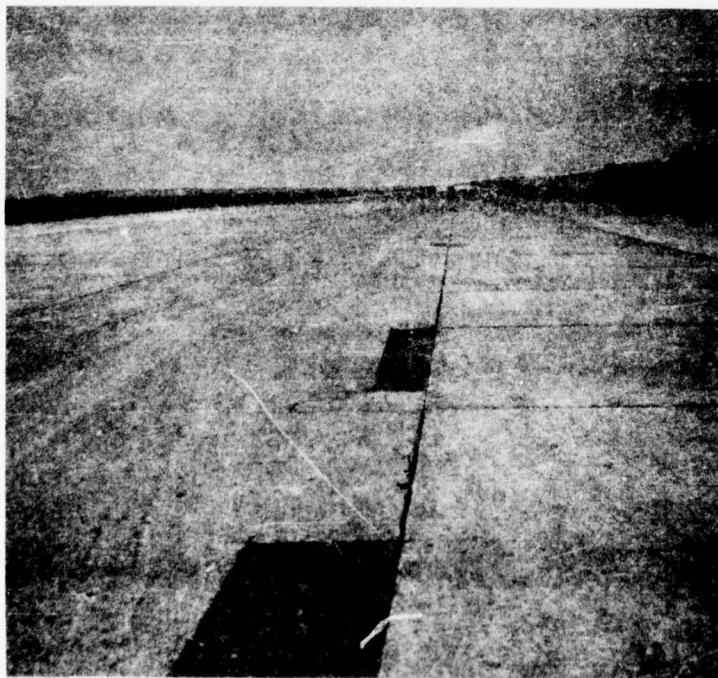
Patched joint spalls near north end of taxiway 26 (feature T4A)
